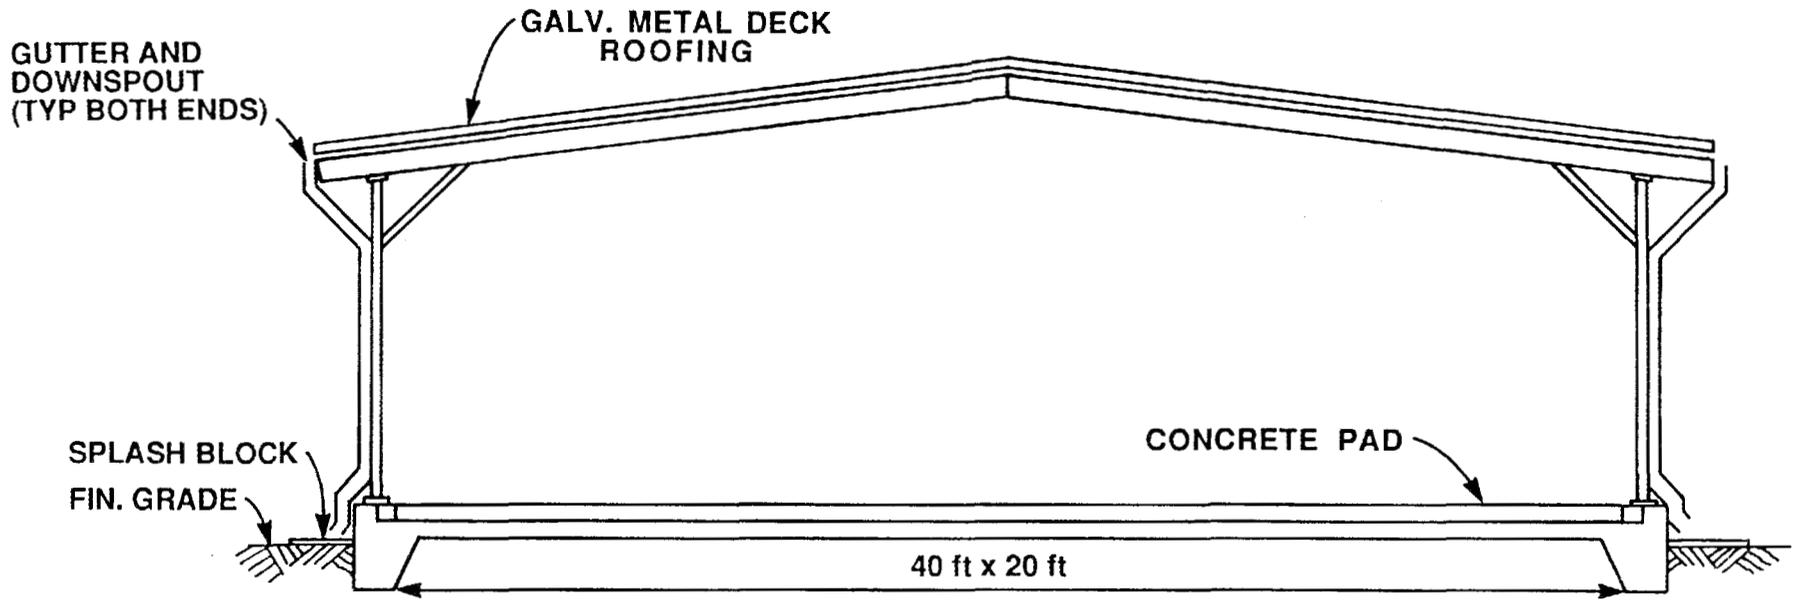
Layout of Building 7651, Clean Oil Storage Pad.
